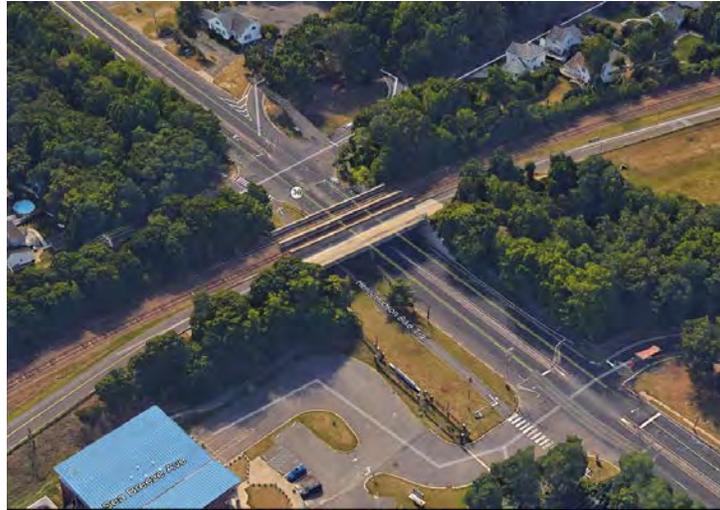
Aerial of Normandy Road at Route 36 looking Southeast (Google Earth view)
